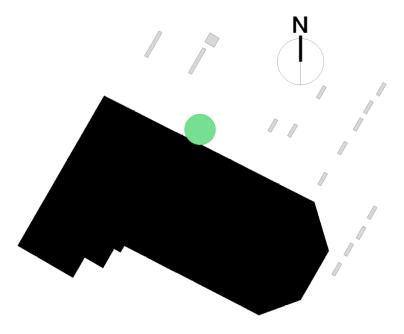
Site plan showing gravestones (grey) and shrub (green)
